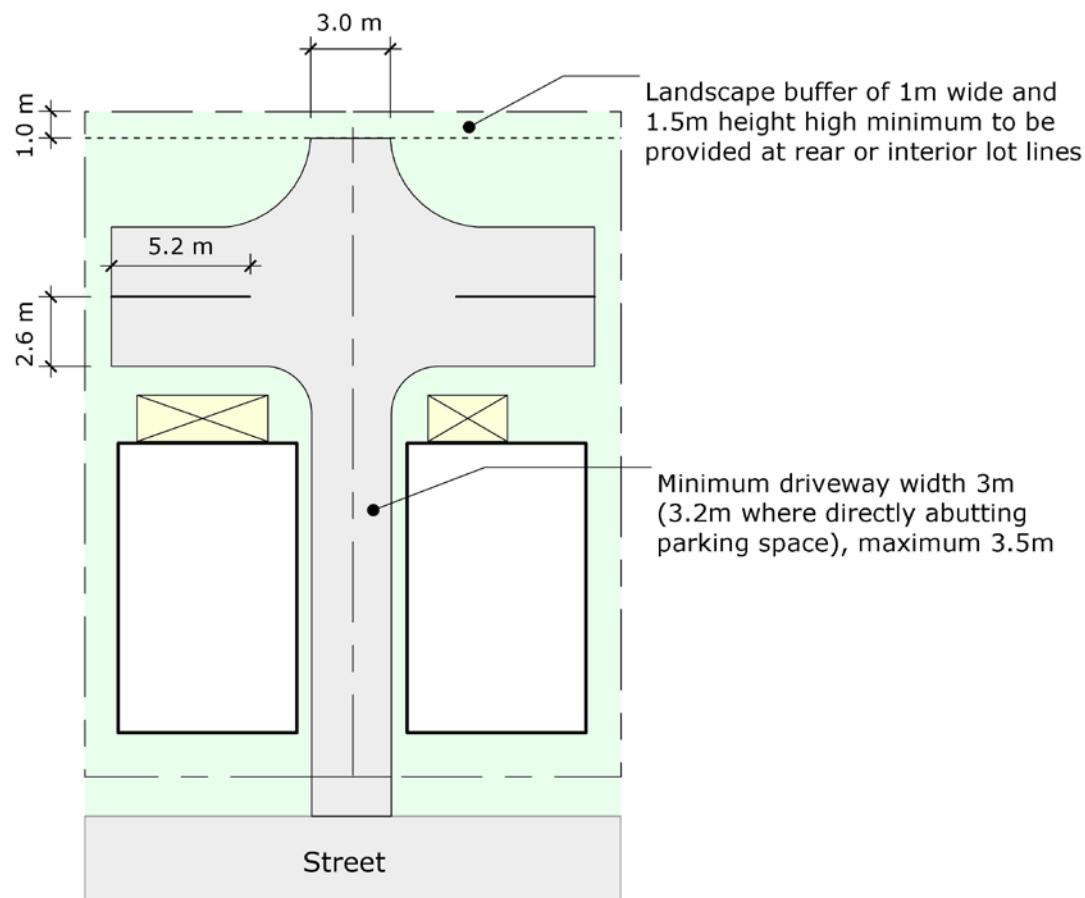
illustrates the minimum and maximum driveway width, the hammerhead turnaround requirement, and the landscape buffer location and size for a shared driveway leading to parking spaces across multiple rear yards.
